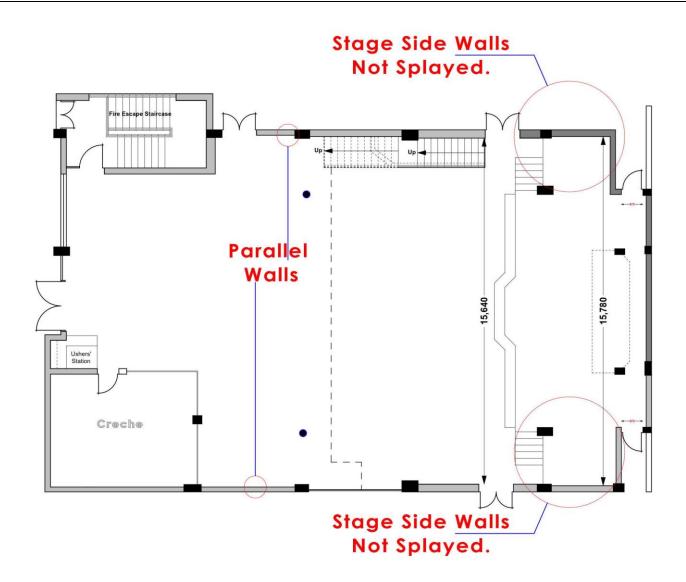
CITAM Parklands – Geometrical Acoustic design failures shown in plan. Copyright: Author.
